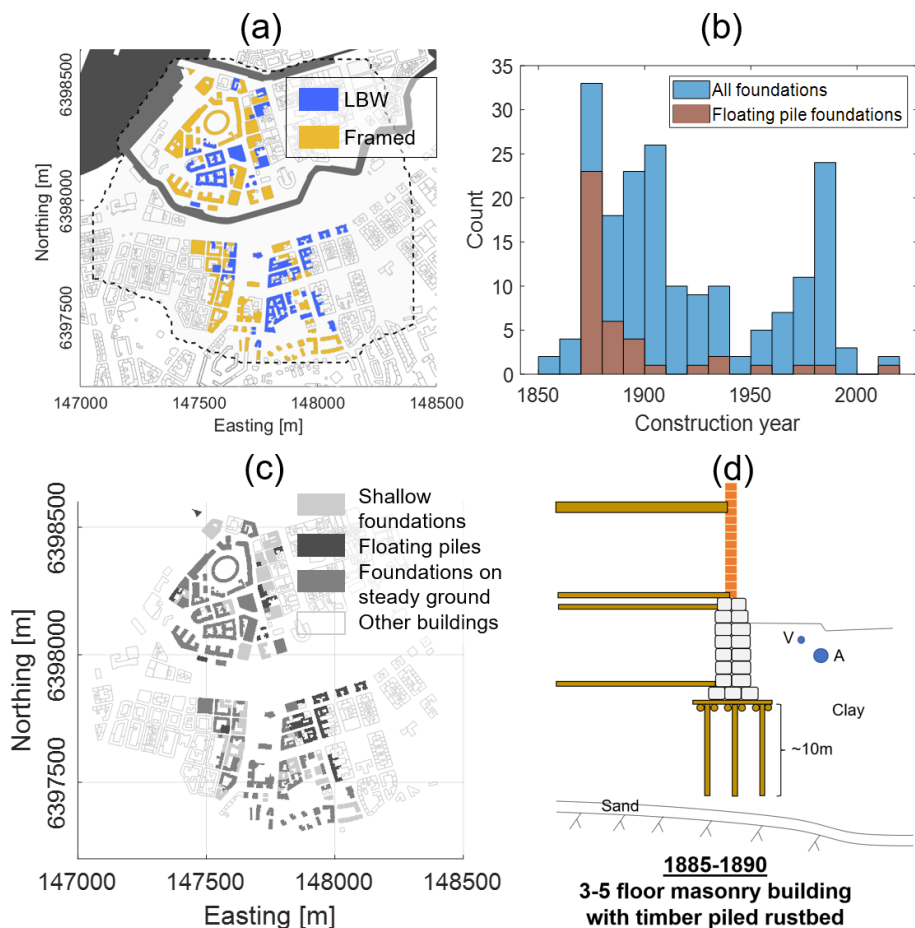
(a) Structural types. LBW is load bearing walls. (b) Building age. (c) Foundation types. (d) Typical cross-section of a wooden pile foundation in Haga.
